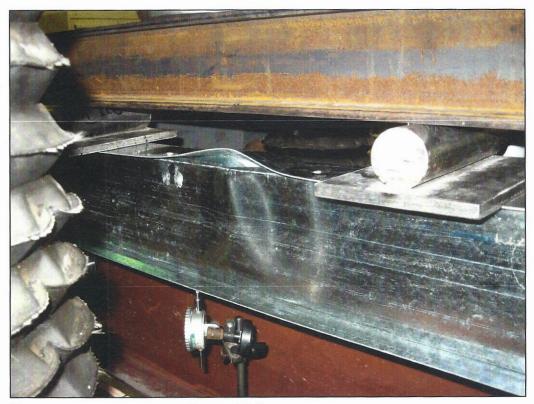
Strong Axis Bending, Flange at Failure
